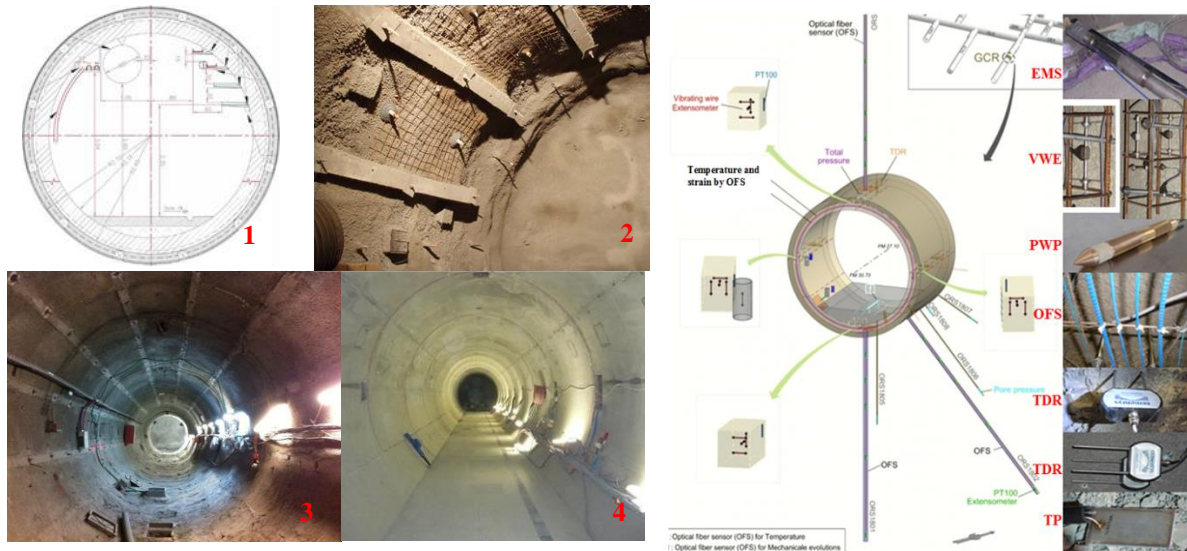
GCR gallery concept (1), beams & bolts (2), entire gallery after excavation and shotcreting (3), with concrete liner and slab (4)
